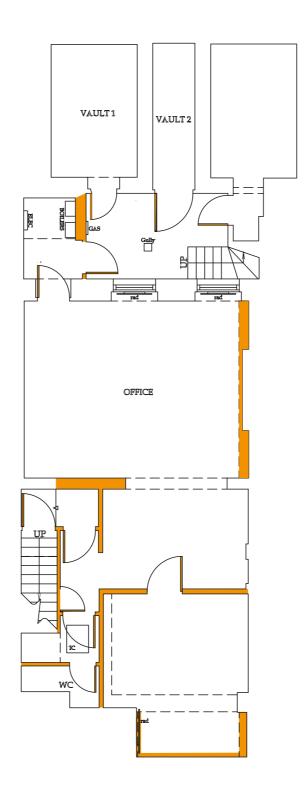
Plans as Existing of 23 Fitzroy Square (2003)
